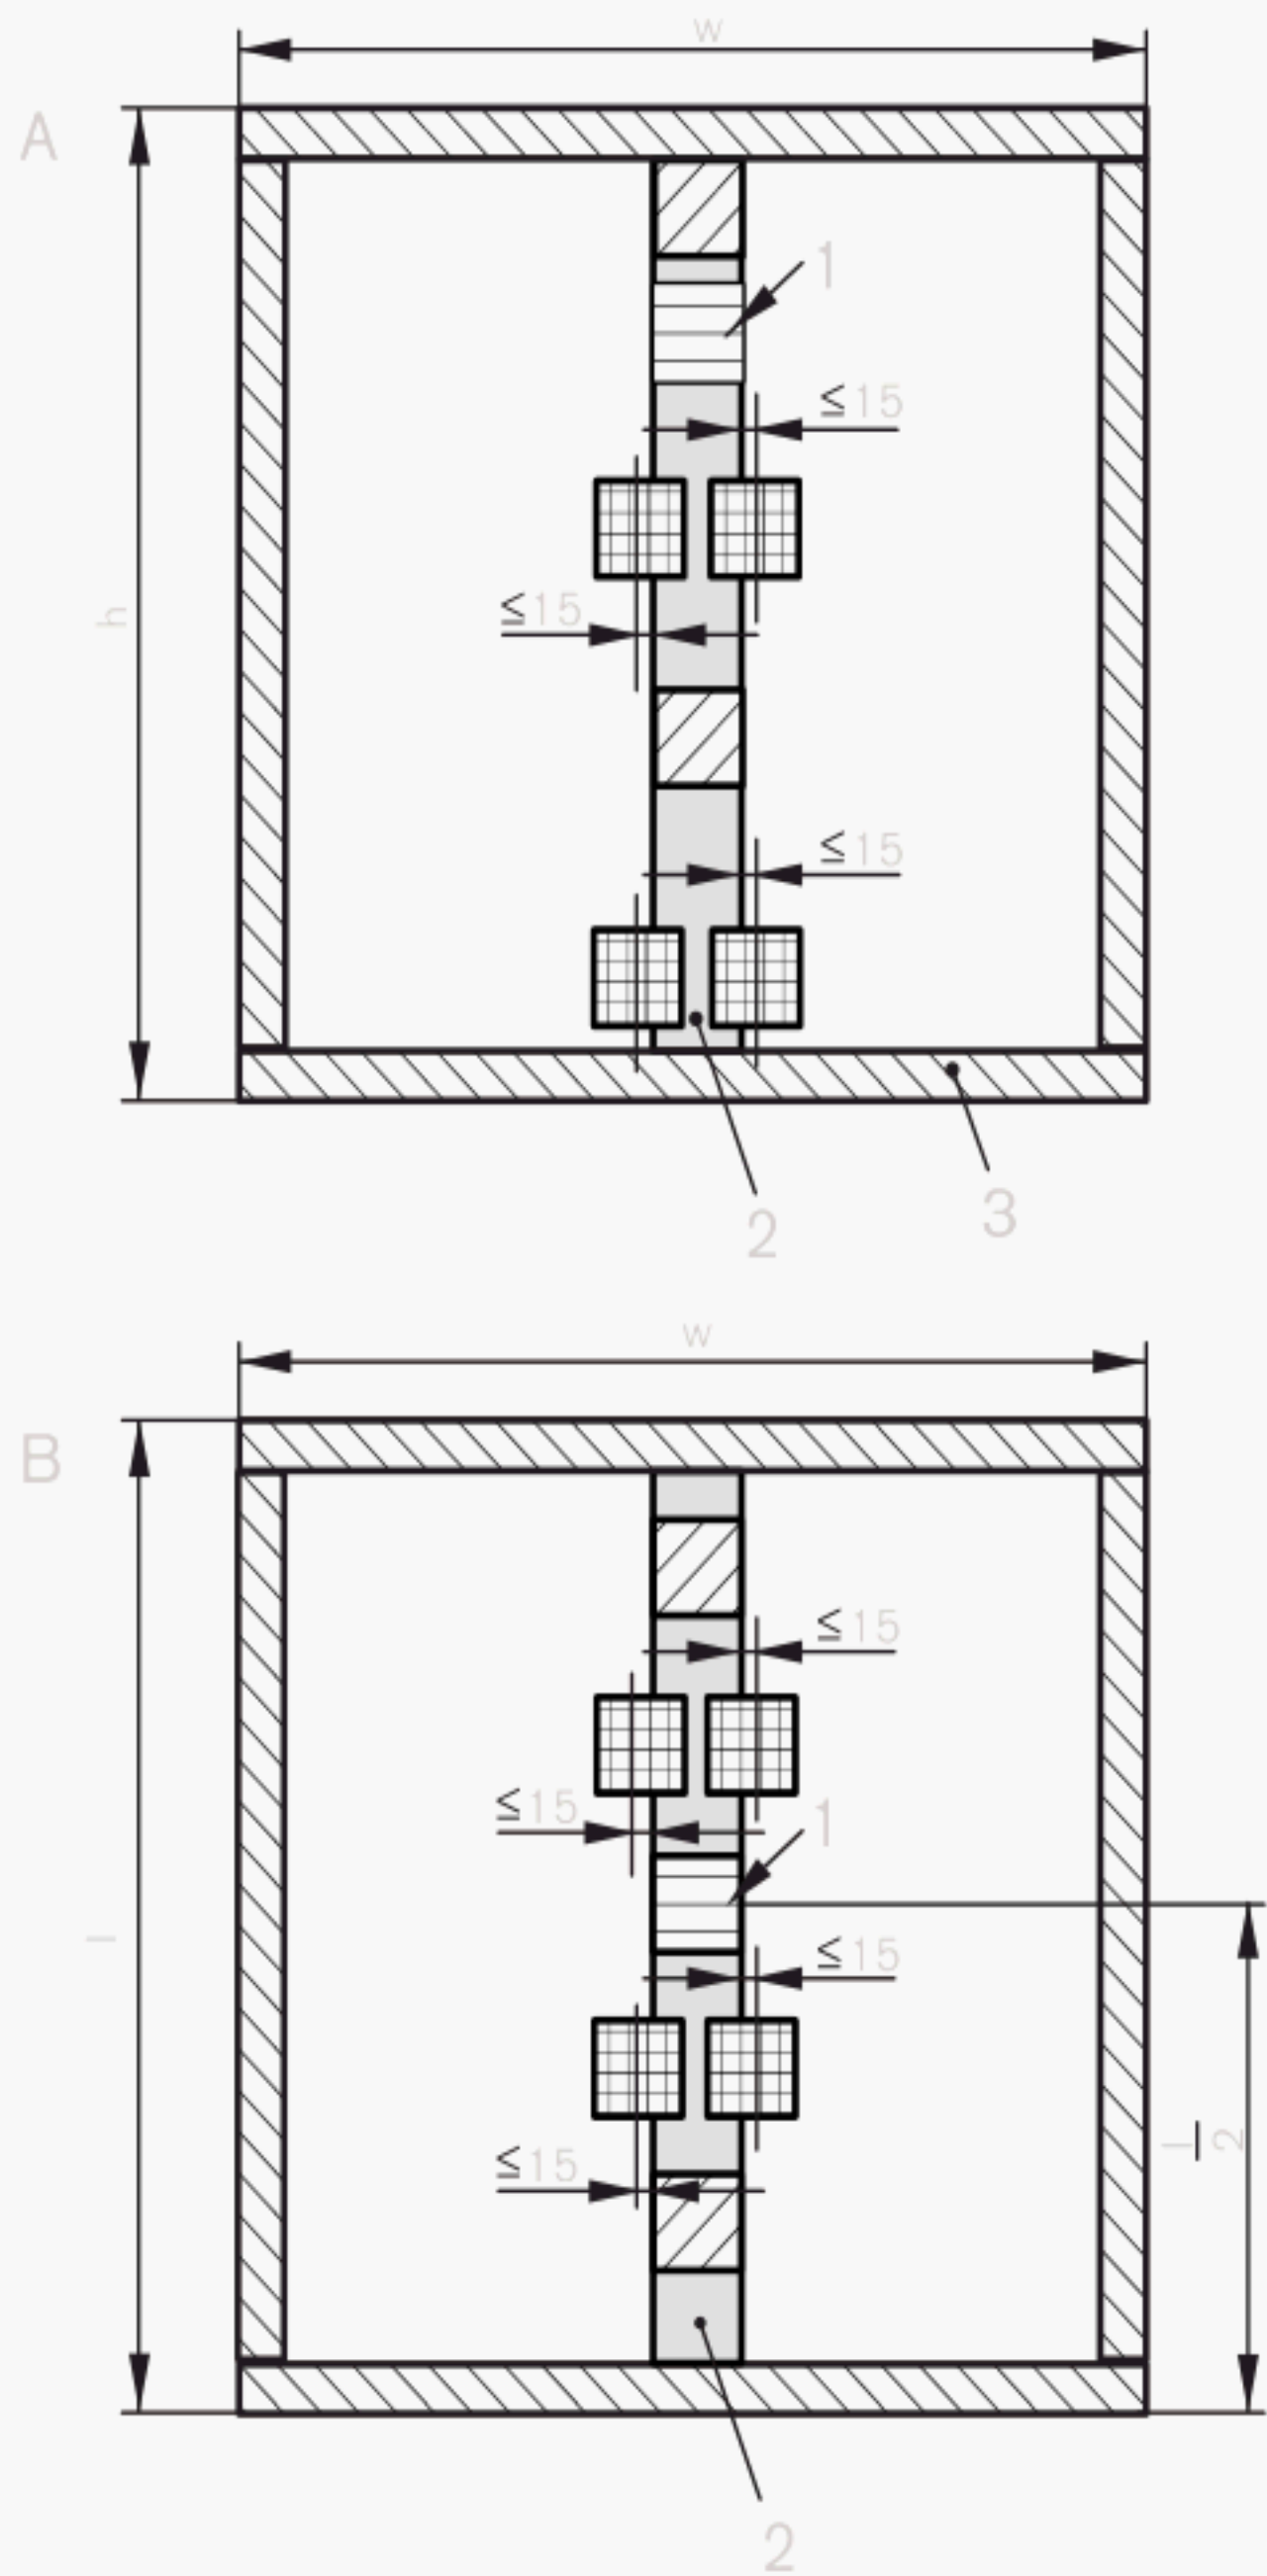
Typical thermocouple layout (full scale vertical furnace, single test specimen)
